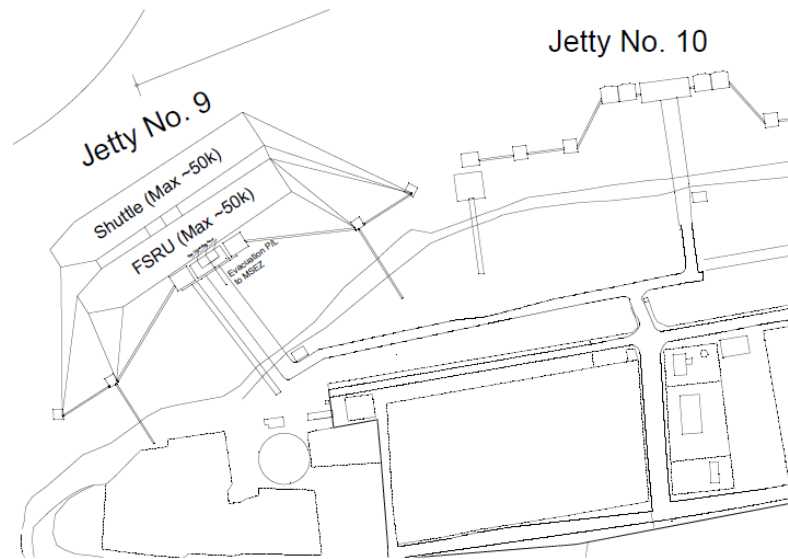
Proposed Mooring Arrangement of FSRU and LNG Carrier at Jetty # 9
